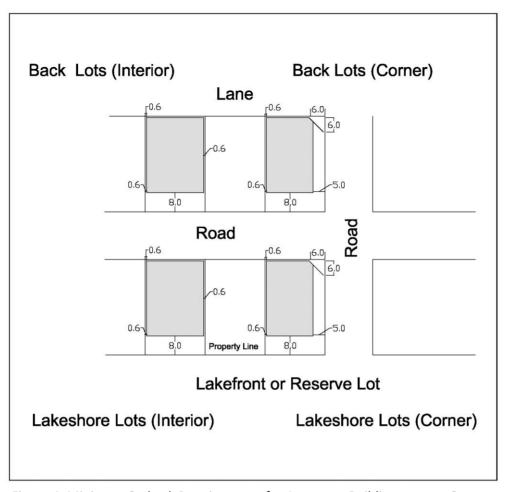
Minimum Setback Requirements for Accessory Buildings except Garages
